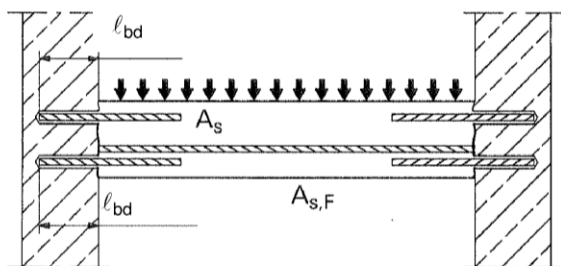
Overlapping joint for rebar connections of slabs and beams
